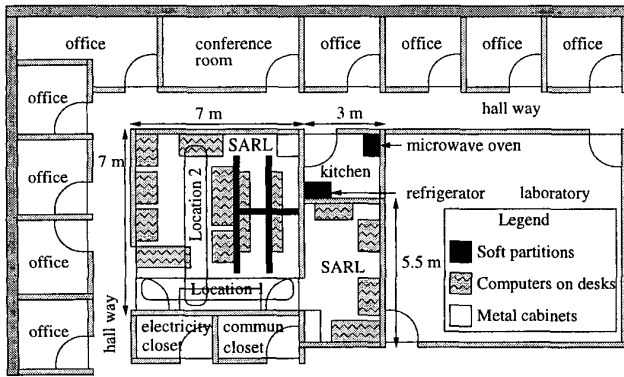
A partial floor plan of the fifth floor of the GCATT building.
